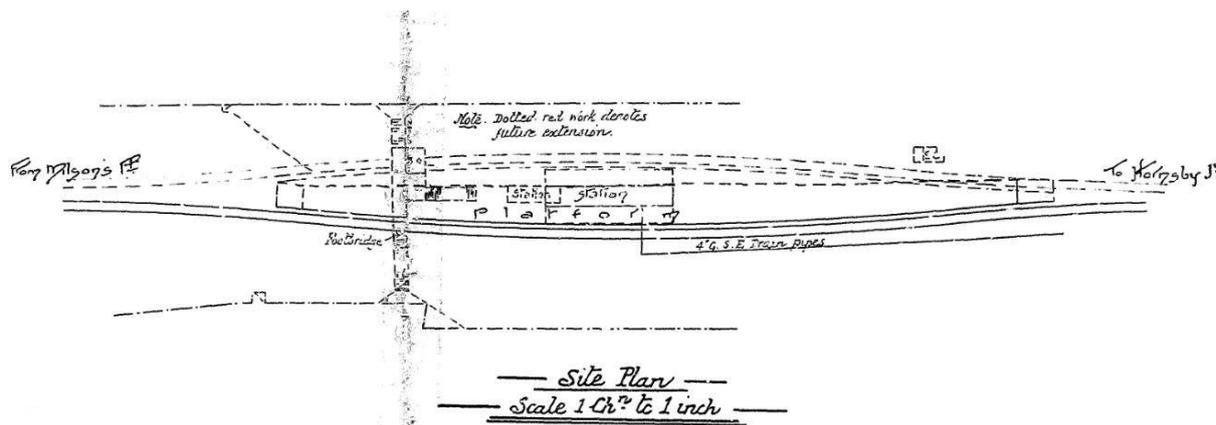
Station layout, c. 1906 (Sydney Trains Virtual Plan Room)
